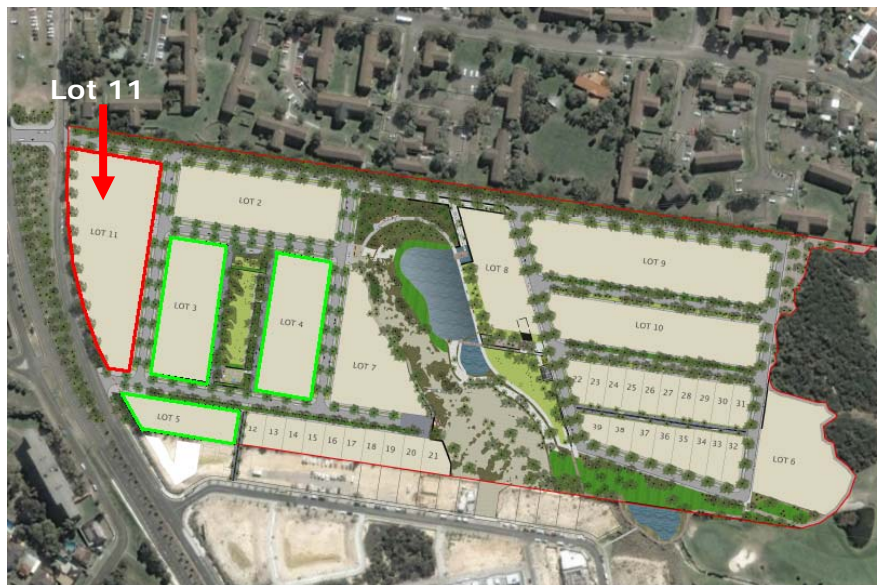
LEC approved Stage 1 subdivision pattern of 1408 Anzac Parade, Little Bay. The subject Lot 11 highlighted in red. Three (3) lots with prior Stage 2 approval highlighted in green.
